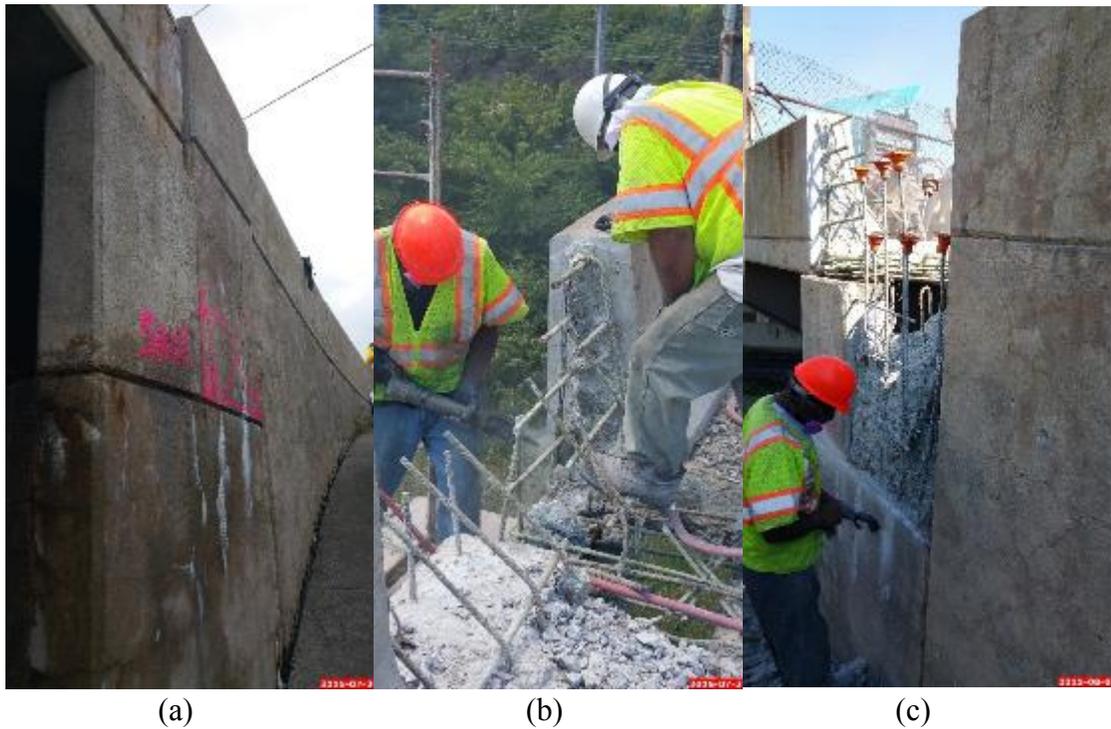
Parapet and Wing Wall Demolition Progression from (a) Pre-Demolition, (b) Demolition of the Parapet, to (c) Pre-Construction
